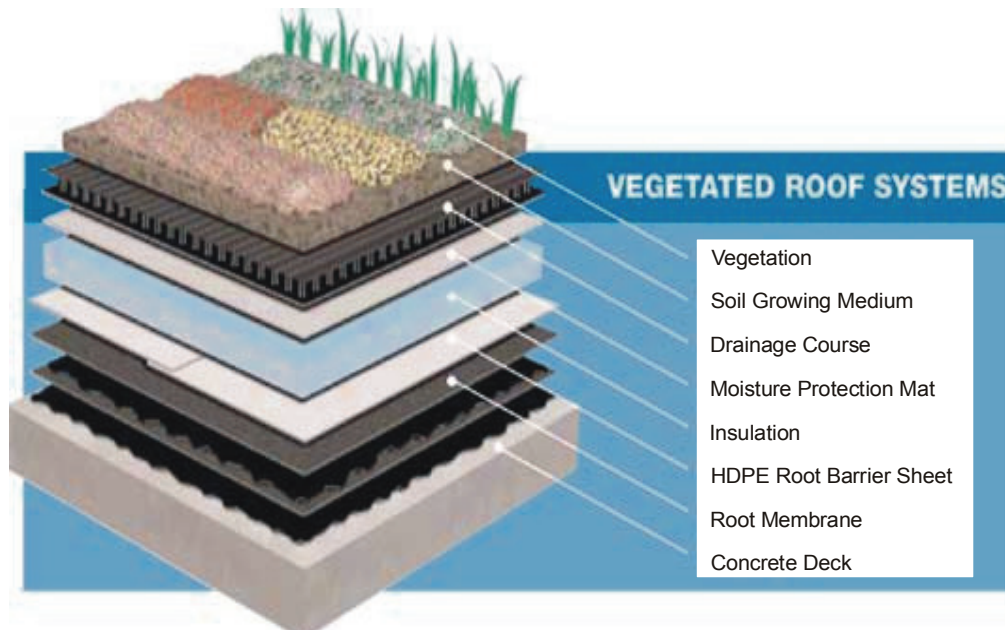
Typical green roof components (Tremco, n.d. - b)
